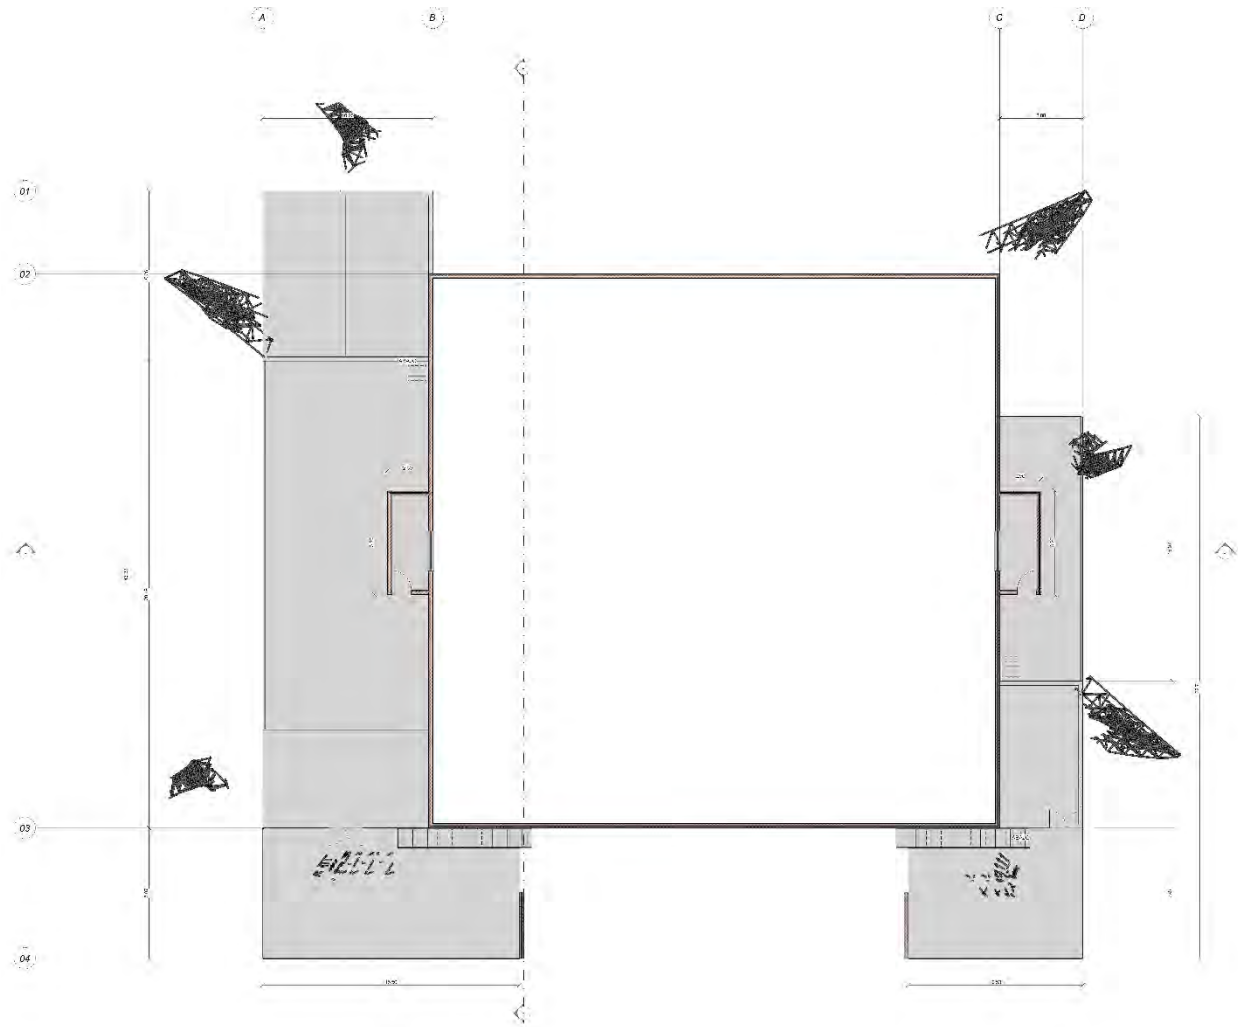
Levels 3-4 plan shaded view, north oriented top (own image from Revit).
